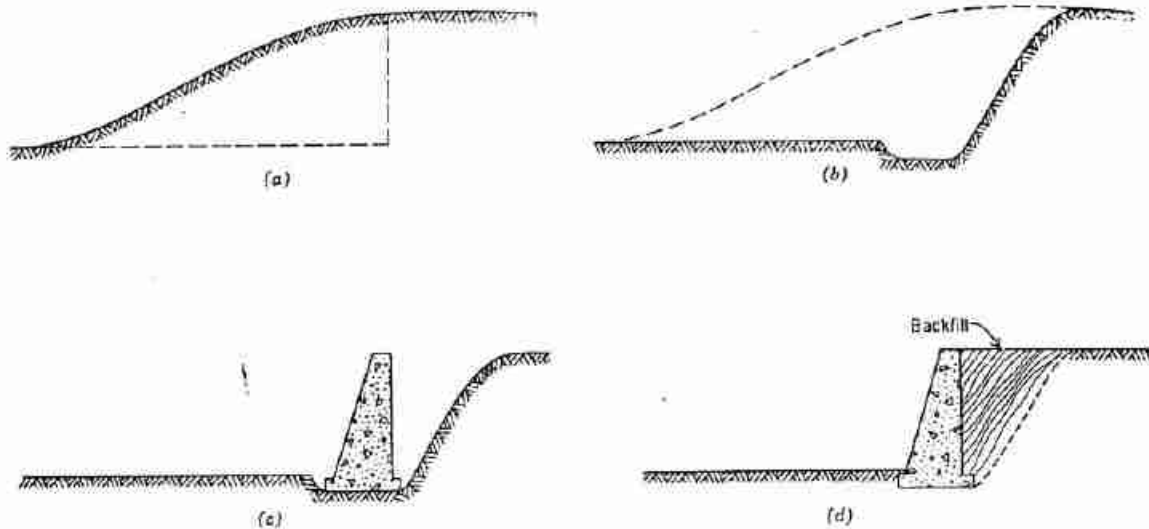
Stages in construction of typical gravity retaining wall. (a) Proposed excavation. (b) Excavation completed. (c) Wall formed and poured. (d) Backfill placed.
